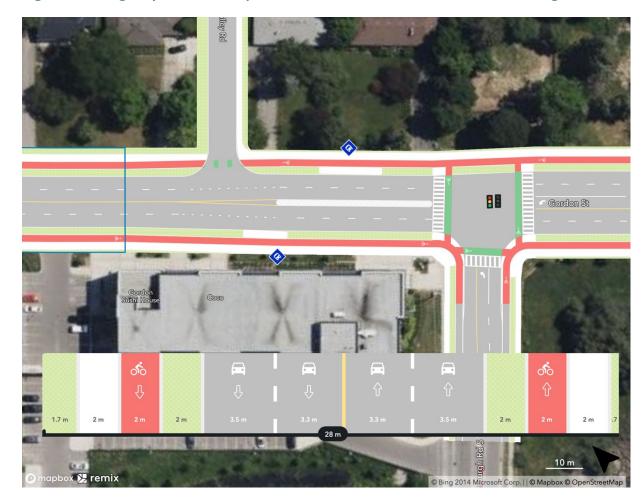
Design Option 3 Example between Clair Road East and South Ring Road
